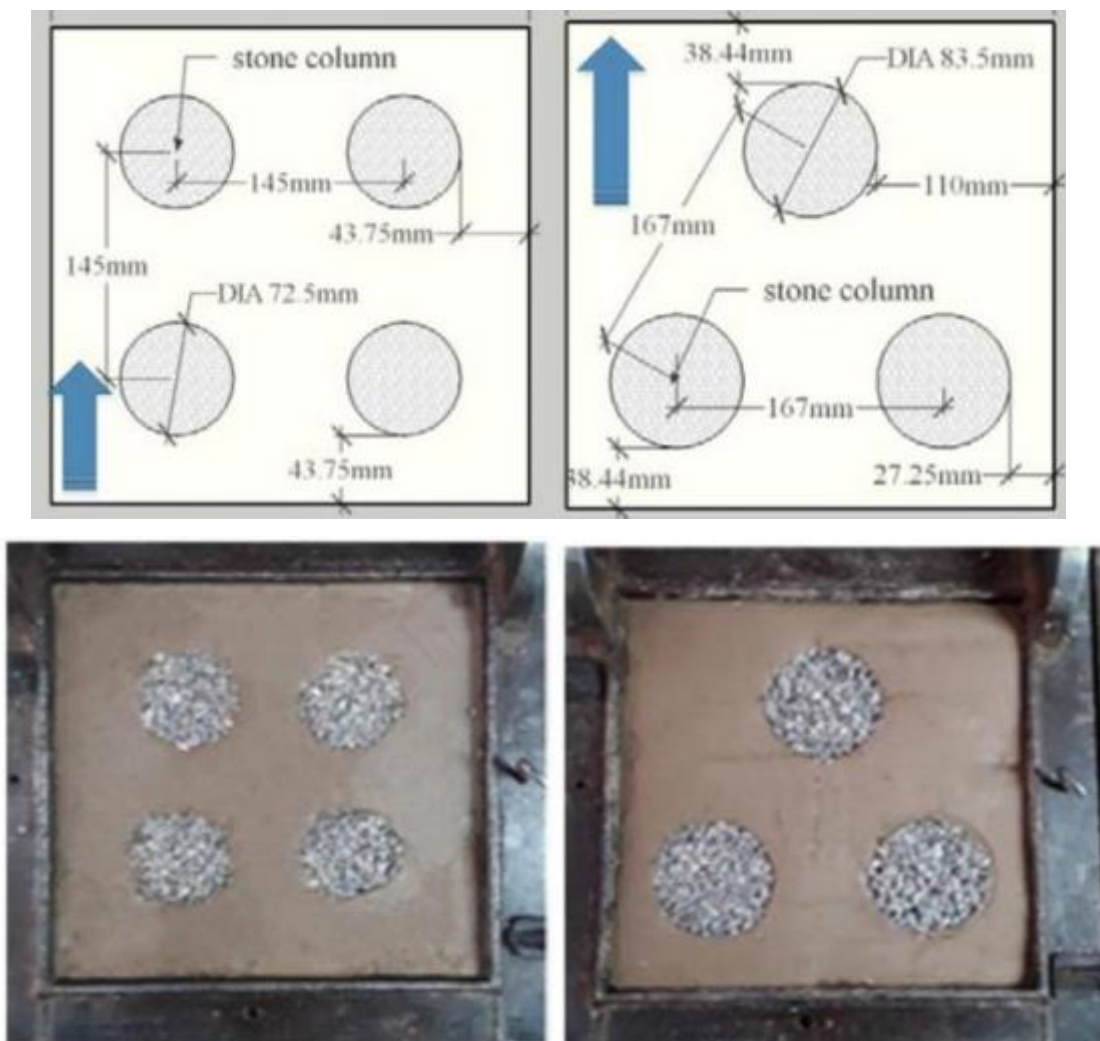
Rectangular and Triangular pattern arrangement of stone column installation (Asllani M. et al., 2019)
